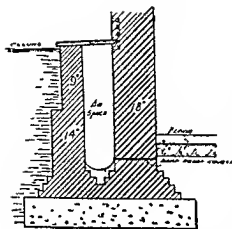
Section through a wall abjoining high ground with a dry area covered and ventilated, which for preference should be made wide enough for cleaning out.
